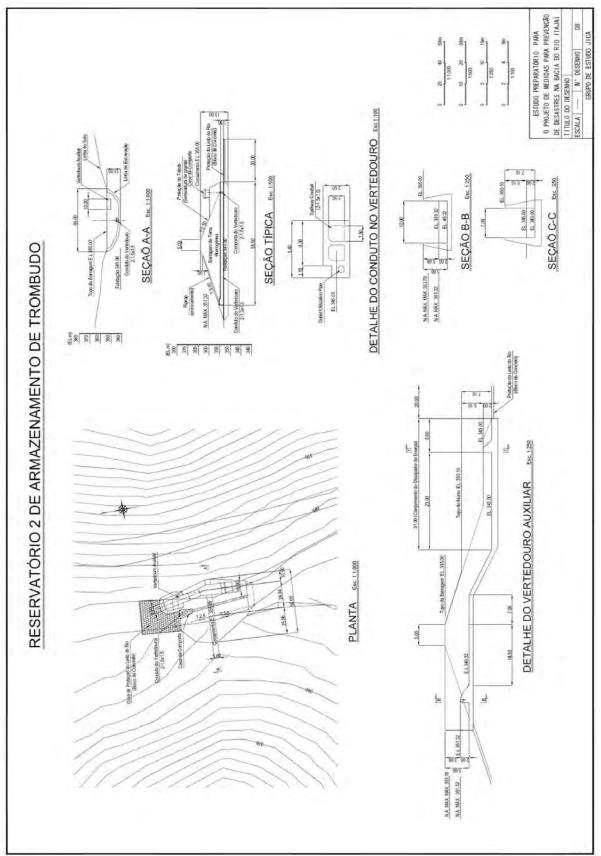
Structural Drawing of Basin Storage (Small Dam) (Site-2 on Trombudo River)
